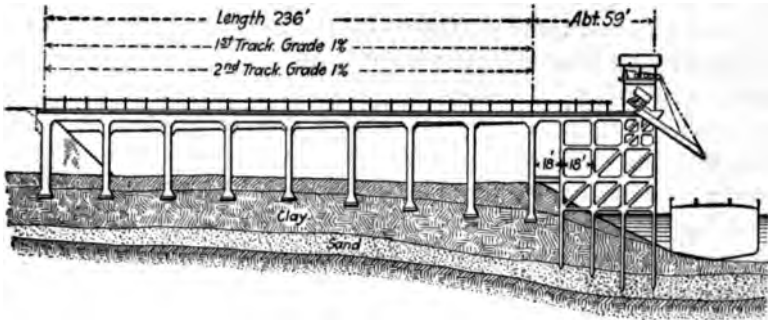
Elevation of Viaduct and Loading Pier, Guadalquivir River, Spain.
